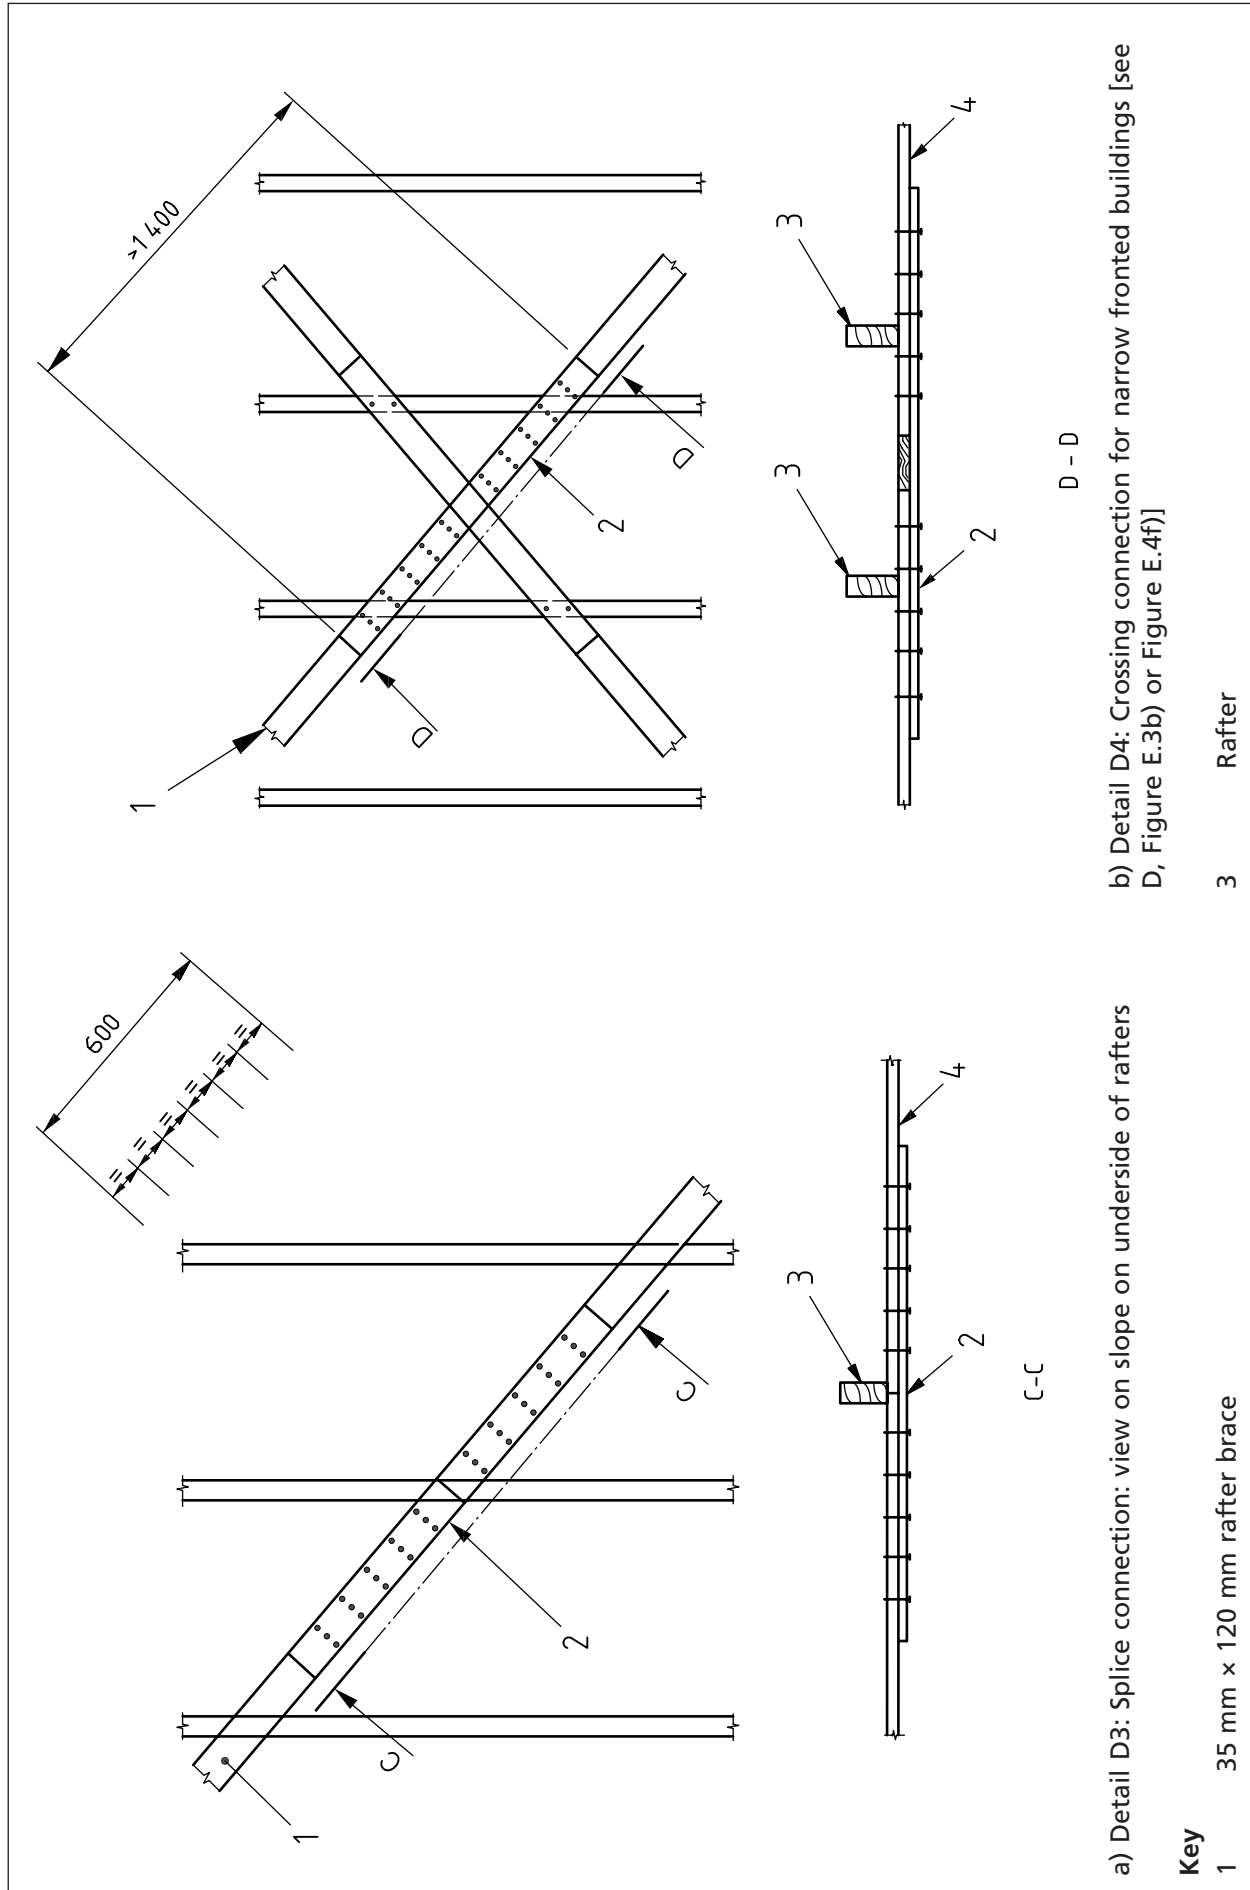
Standard bracing for rafter members: detail D3 splice connection and D4 crossing connection
